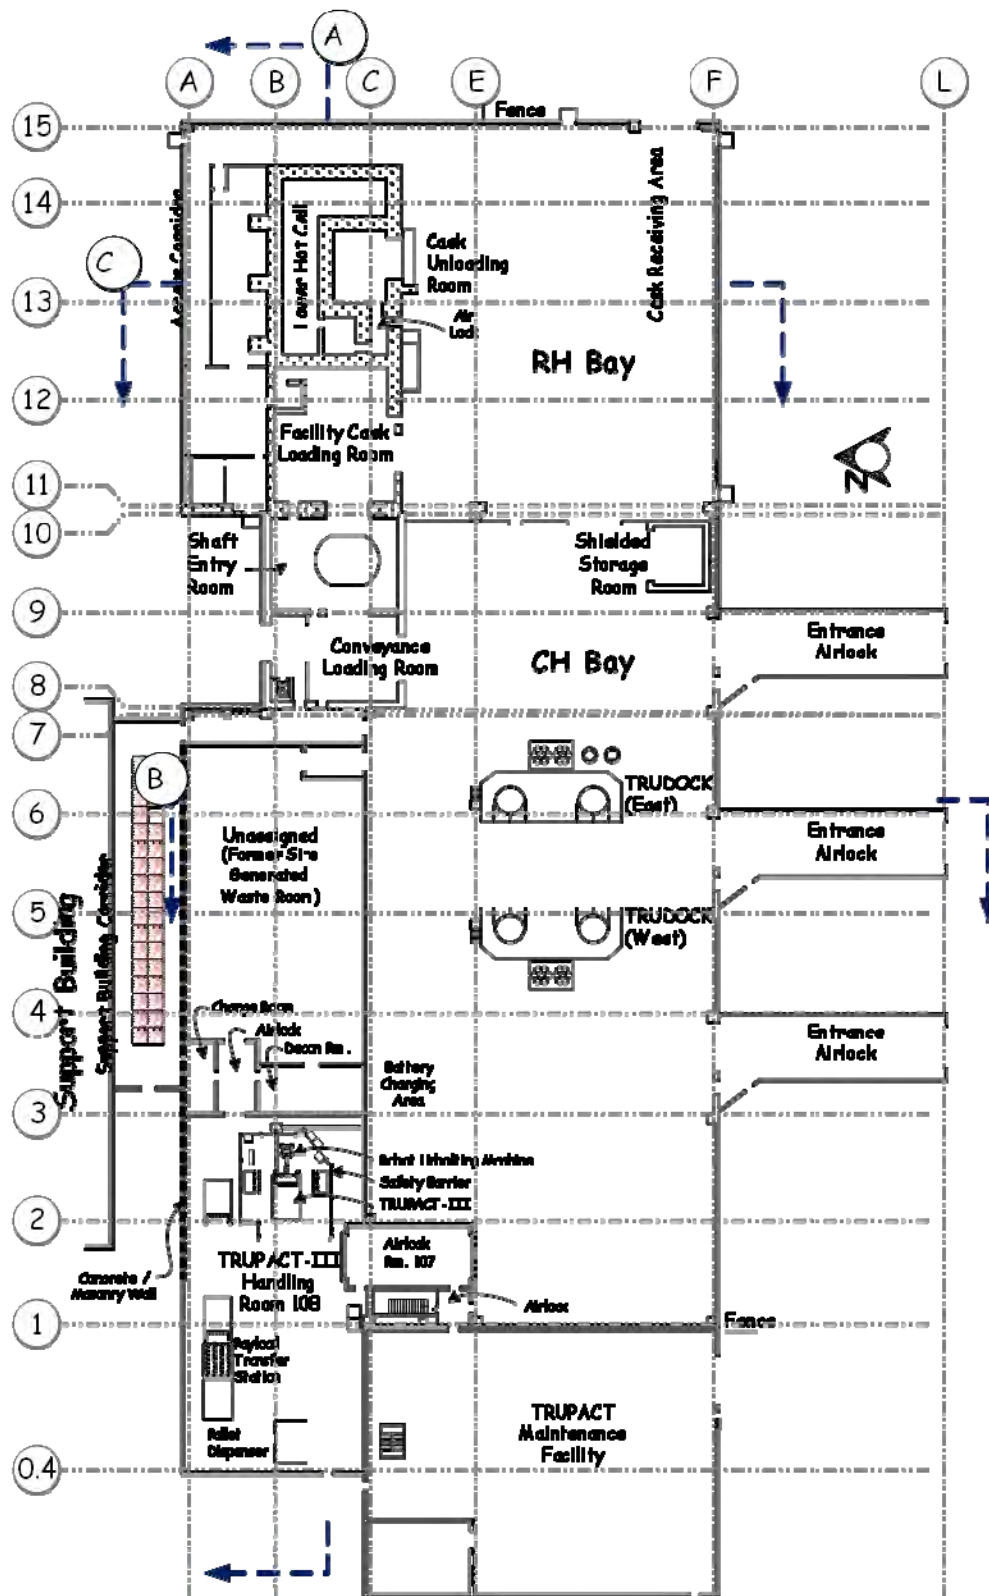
Waste Handling Building Plan (Ground Floor)
